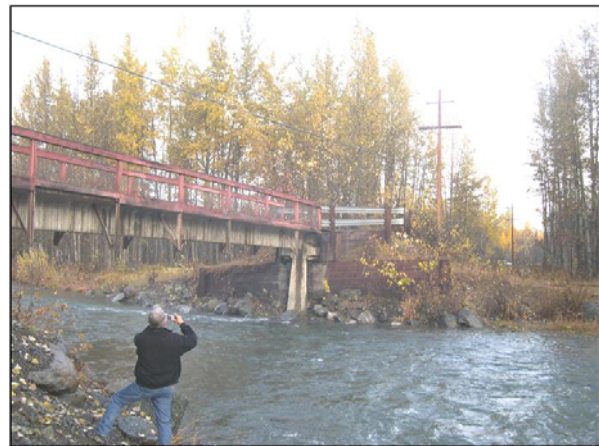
Existing Footbridge Over Ship Creek on Fort Richardson
